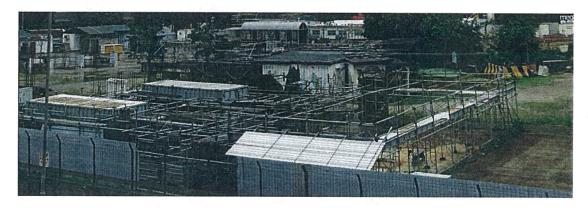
Views of CICTA Sheung Yuet Road Training Ground (a ventilation pocket)
